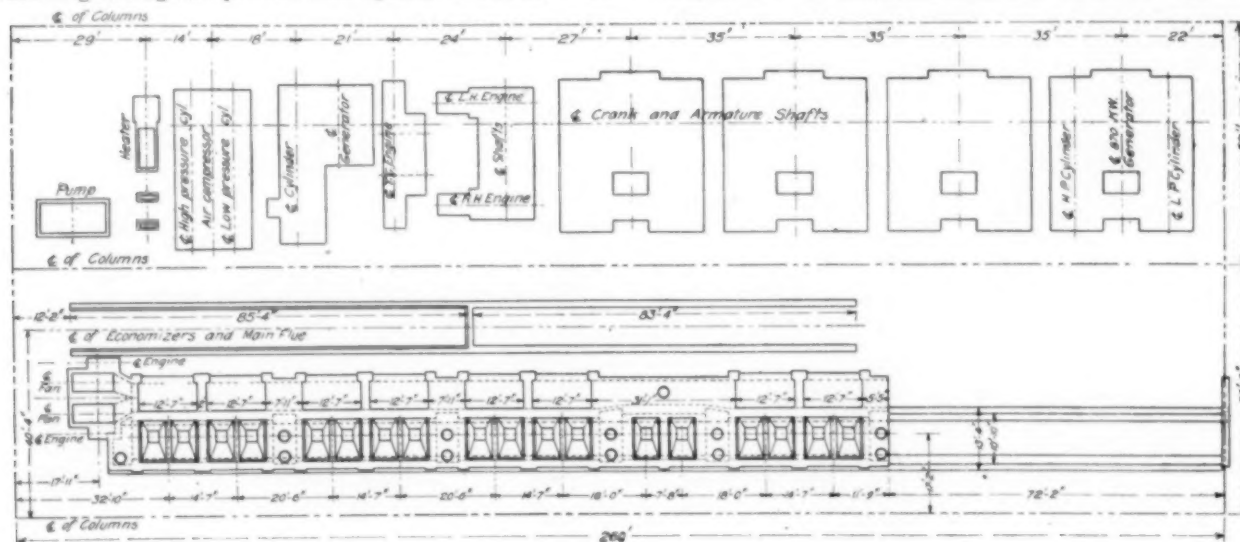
FOUNDATION PLAN OF POWER HOUSE.
